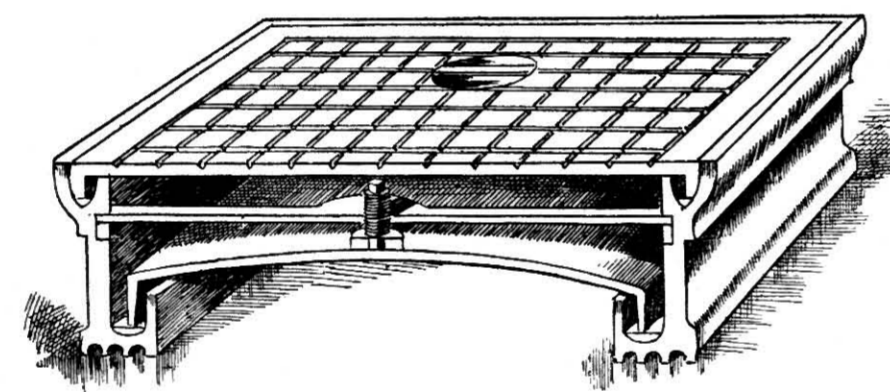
Section of Jones's Air-tight Double-seal Manhole-cover.
